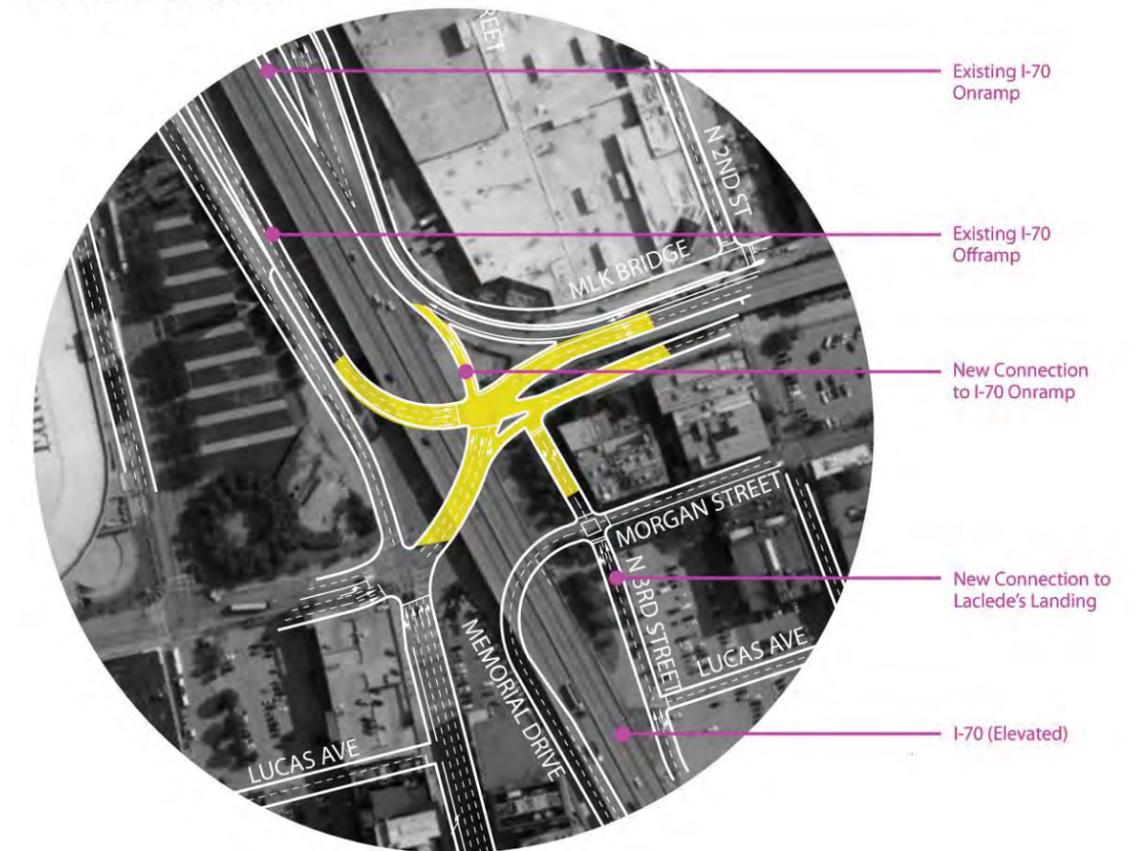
Proposed North 3rd Connection to Westbound I-70 Ramp at MLK Bridge Landing
